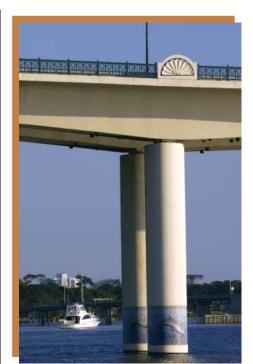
Broadway Bridge in Daytona Beach, Florida. Photo courtesy of Figg Engineering Group.
